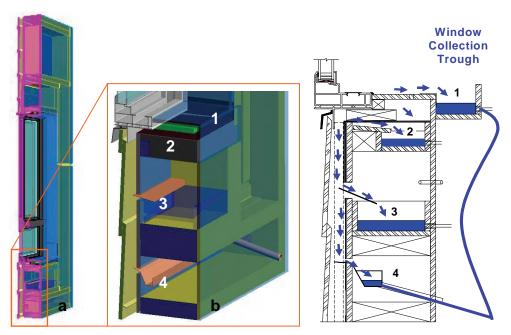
(a) Vertical wall section showing location (b) of water collection troughs at (1) window on interior side of test specimen, (2) beneath window in removable subsill; (3) beneath subsill for collection of water drained from subsill and, (4) lower most trough for collection behind siding.
